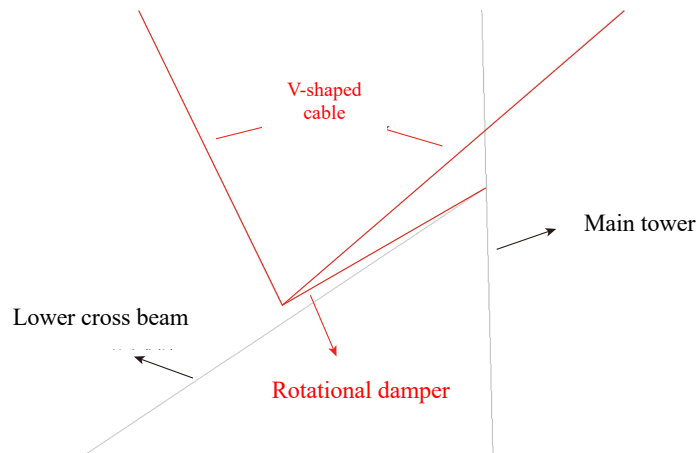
Damping device detail of the V-shaped damping cable
